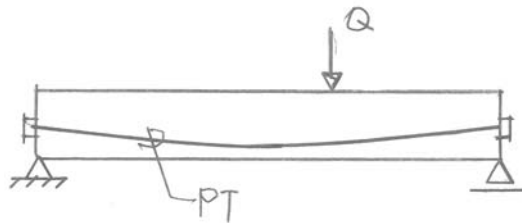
PRESTRESSED MEMBER UNDER EXTERNAL LOAD Q
